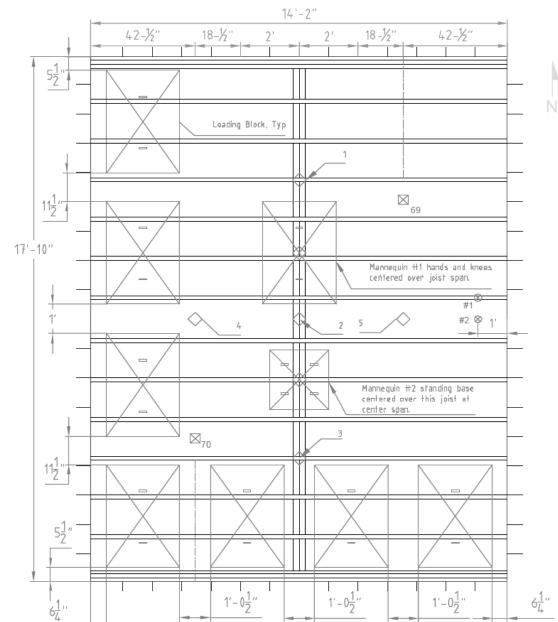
Loading and Instrumentation Layout (See Figure A.1.8).
